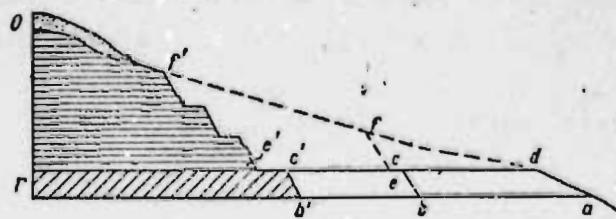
Open-pit layout on a flat bed with sloping ground surface (from Shevyakov, p. 594).
